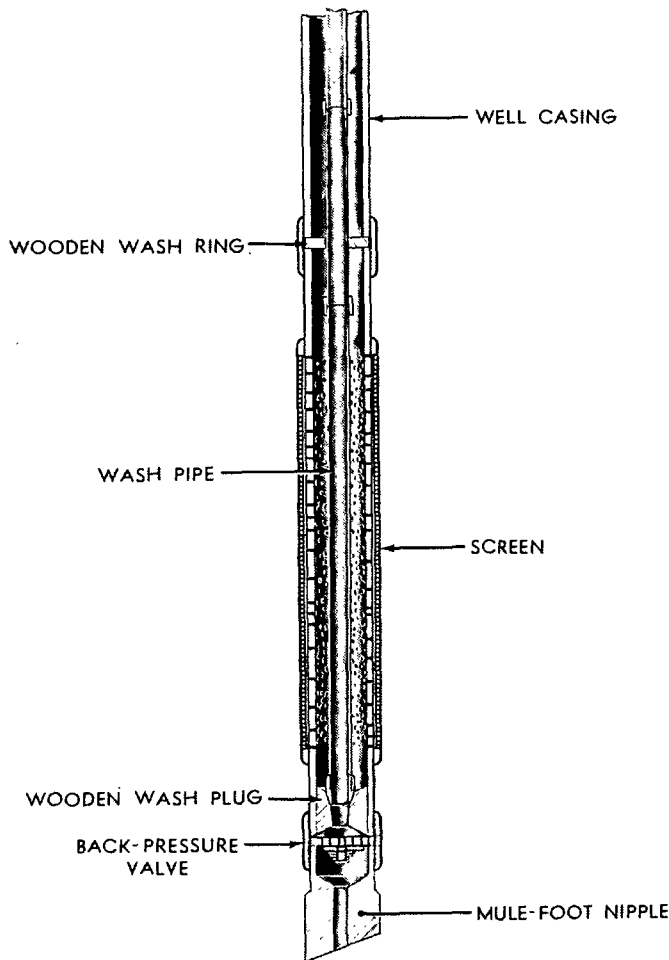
Single-string assembly of screen and casing with wash-down fittings.
